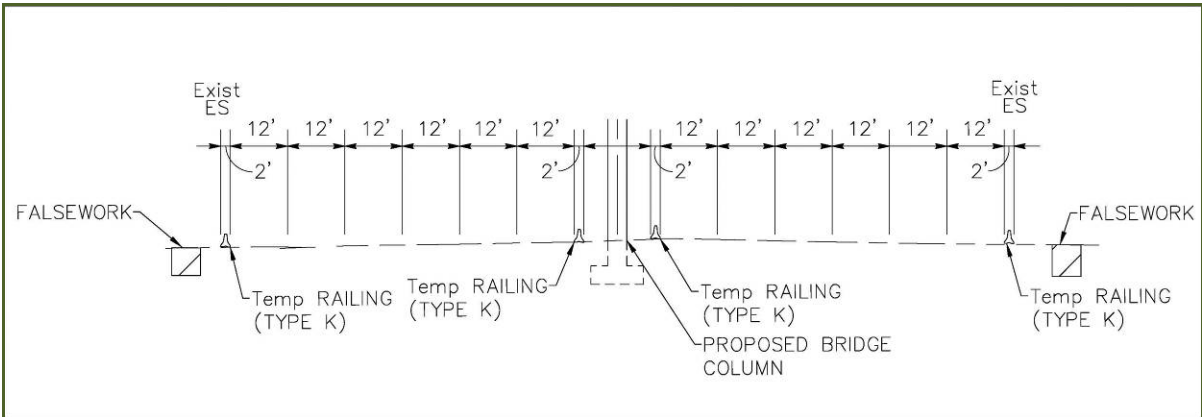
Proposed Temporary Highway 101 Cross Section- Construction Stage 2
